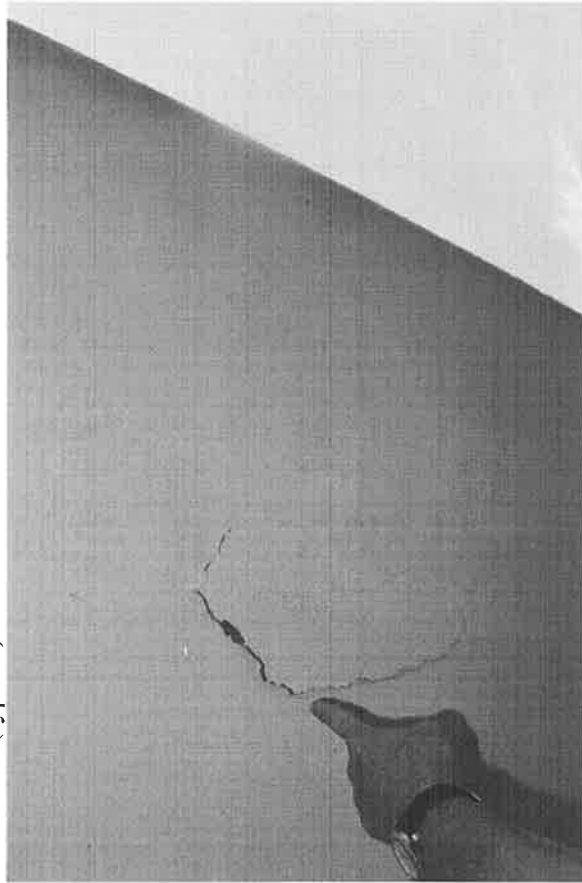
Existing repair to exposed surface of hollow core concrete panel at unit 1101 (typical)
